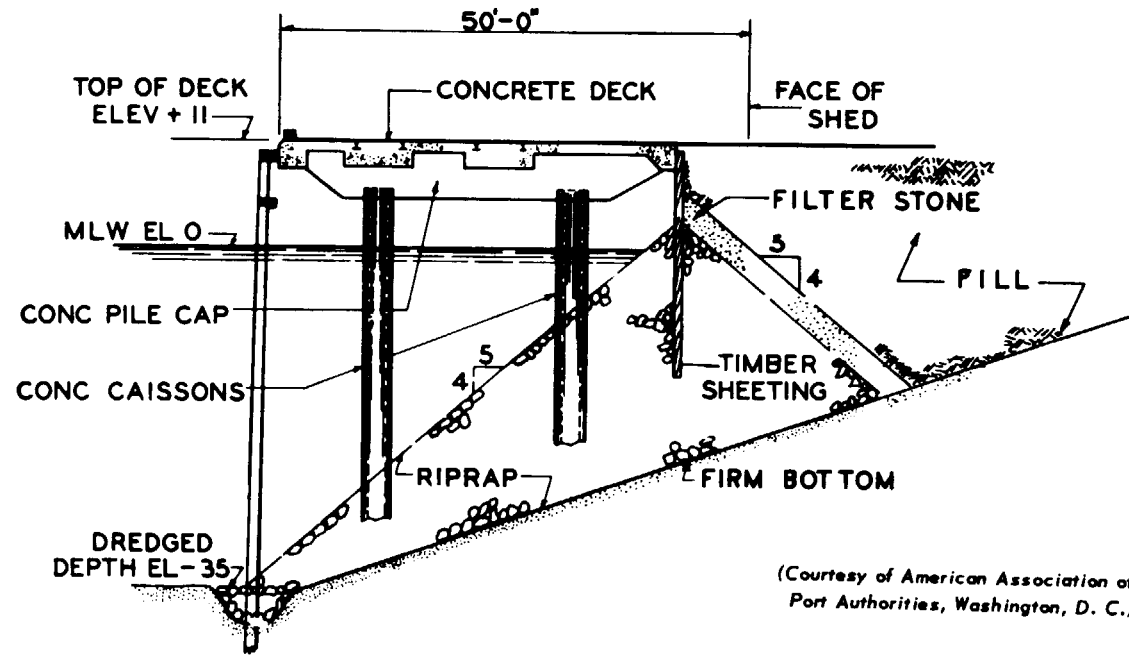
High-Level Open-Type Wharf Construction with Concrete Deck on Precast Prestressed Concrete Caissons.
